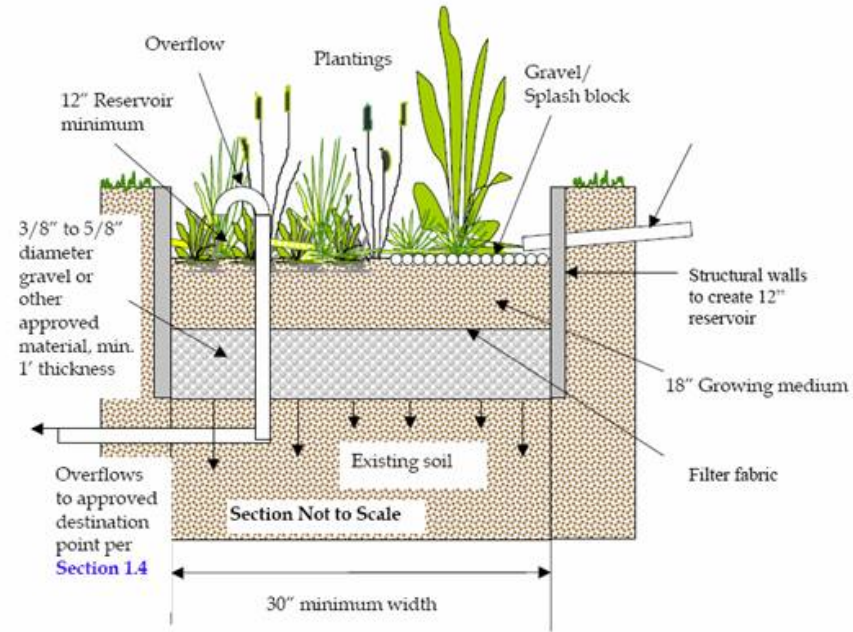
Typical profile of stormwater infiltration planters with an overflow pipe connected to the storm drain (Source: City of Portland 2004 Stormwater Management Manual)
